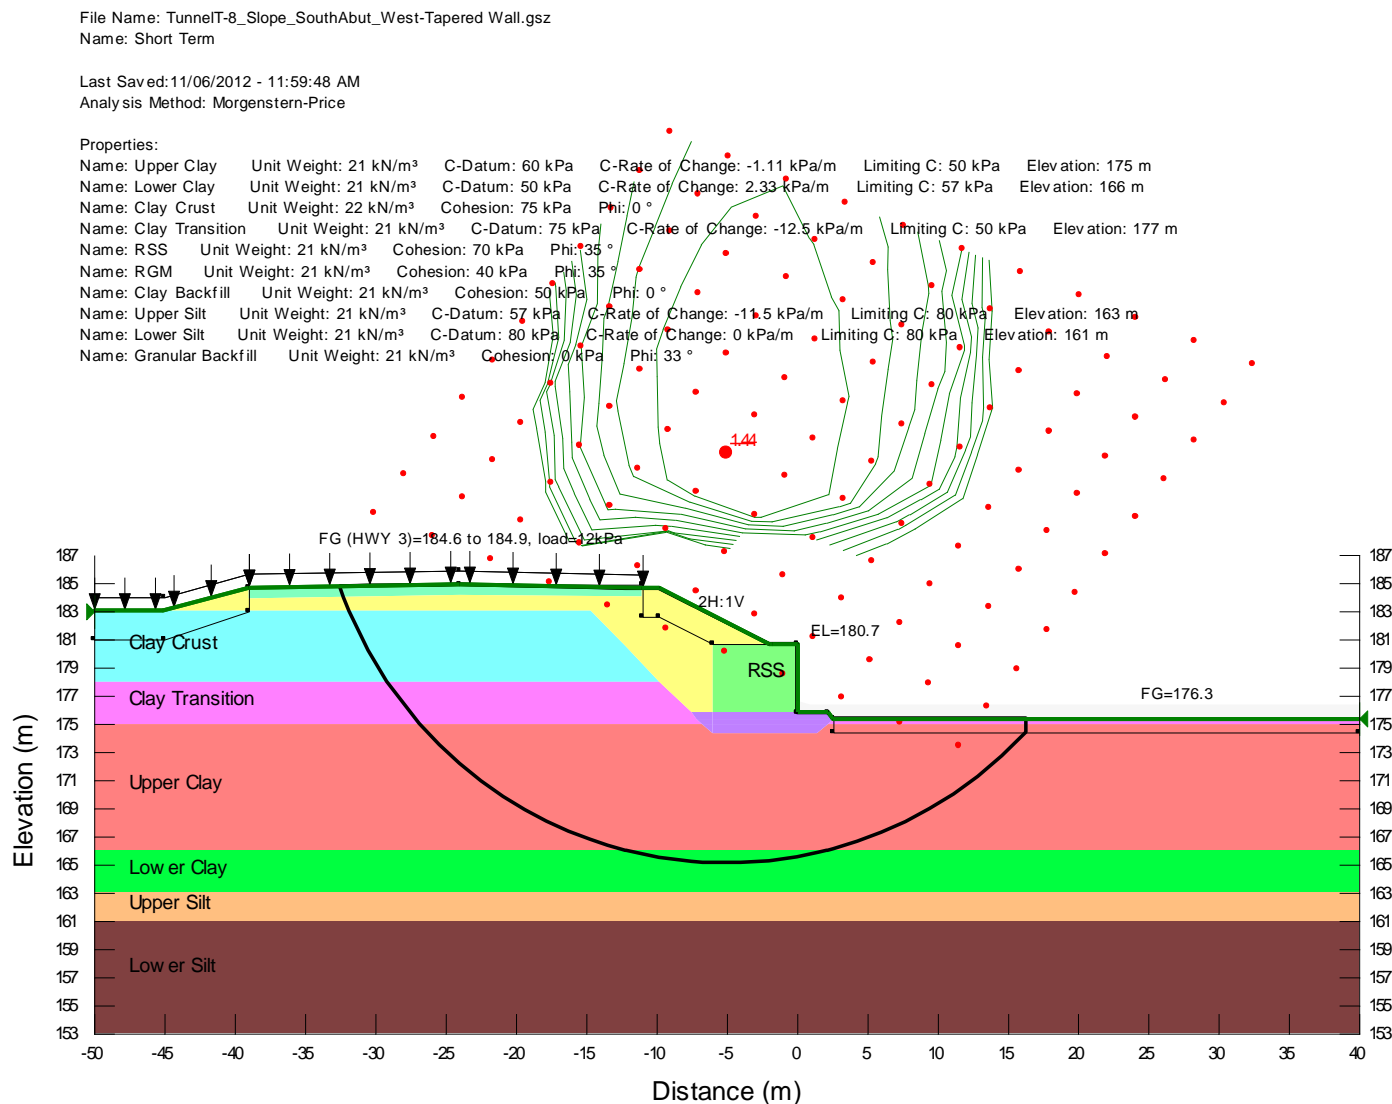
Global Stability Result – Tapered Wingwall South (West Segment)– End of Construction (Undrained) Loading
